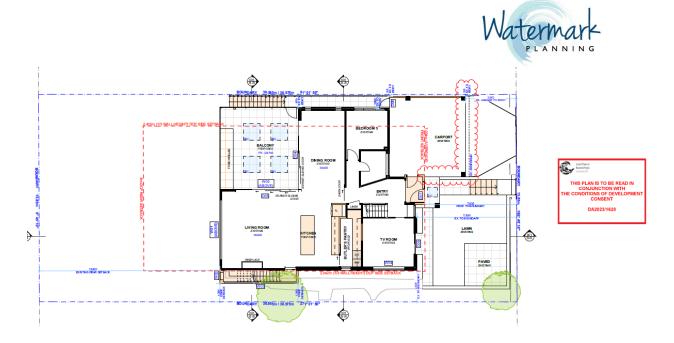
Extract from Approved Stamped Plans showing Ground Floor Level (DA08)
